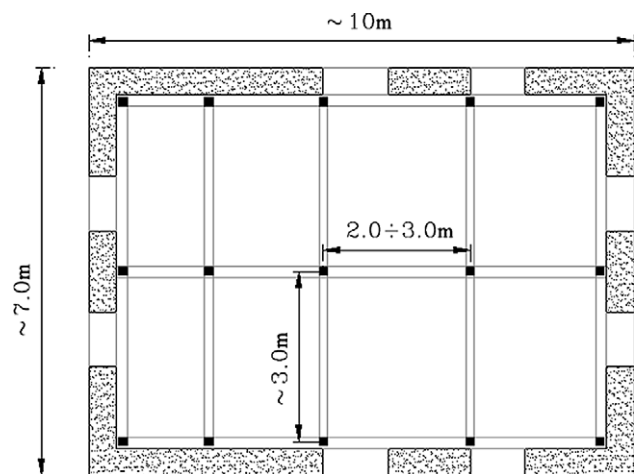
Arrangement of the secondary timber system in a typical building (schematic).
